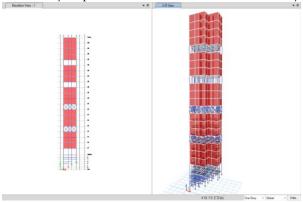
Elevation & 3D view of the building with bracing at 4th+8th floors on 25° sloping ground
